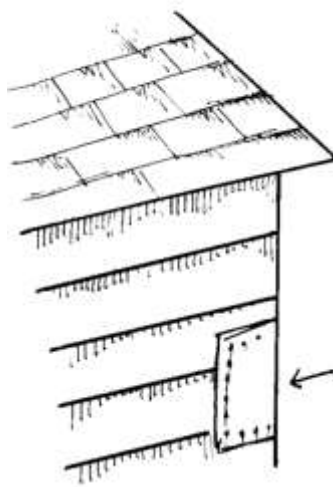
Raccoon access to rooftops can be eliminated by pruning back overhanging limbs and tacking slick sheets of metal at least 3 feet square around corners of buildings.
